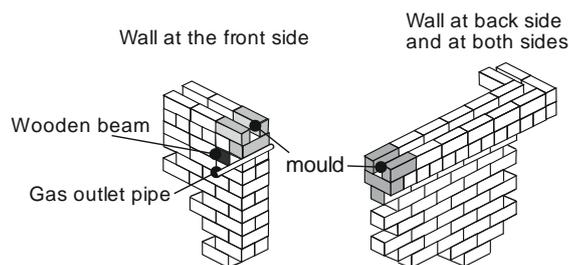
Step 13 – 16: How to form the mould and to fix the gas outlet
